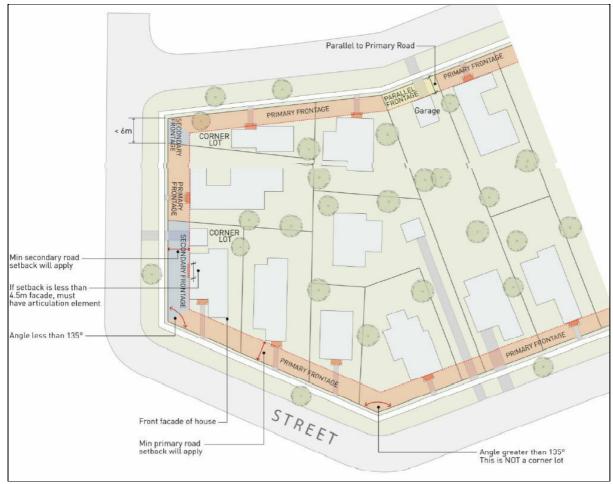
Site Layout explanation for types of Road Frontages, Setbacks & Articulation Zones
